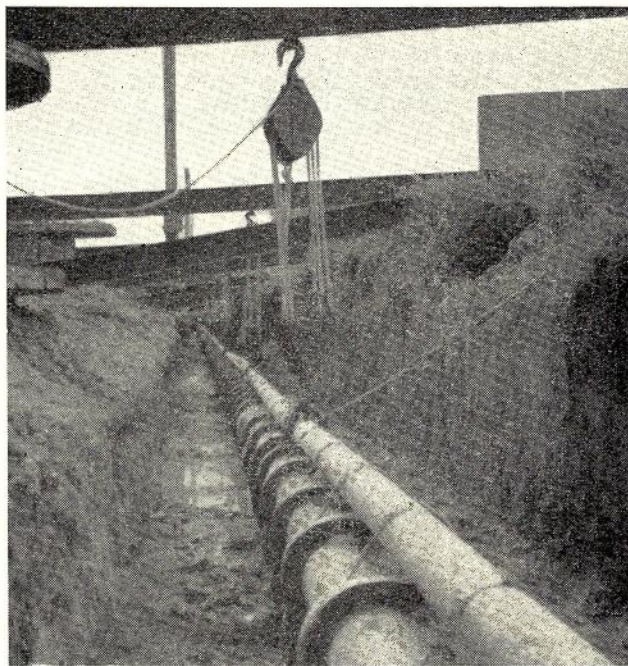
Lowering completed. Conduits lying on floor of trench.
